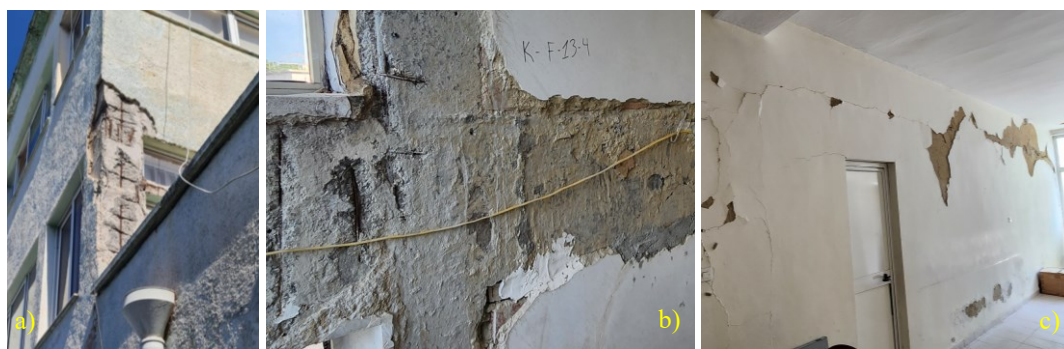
Observed post-earthquake damages: a), b) corrosion of reinforcement bars; c) Cracks and detachment of plaster layers.
